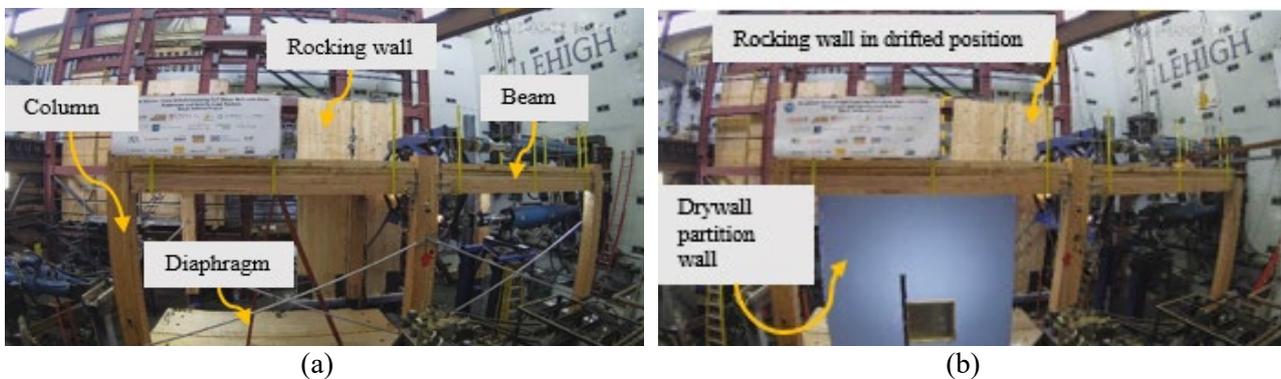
(a) Testbed structure; (b) testbed structure with drywall partition walls subjected to 5% drift
